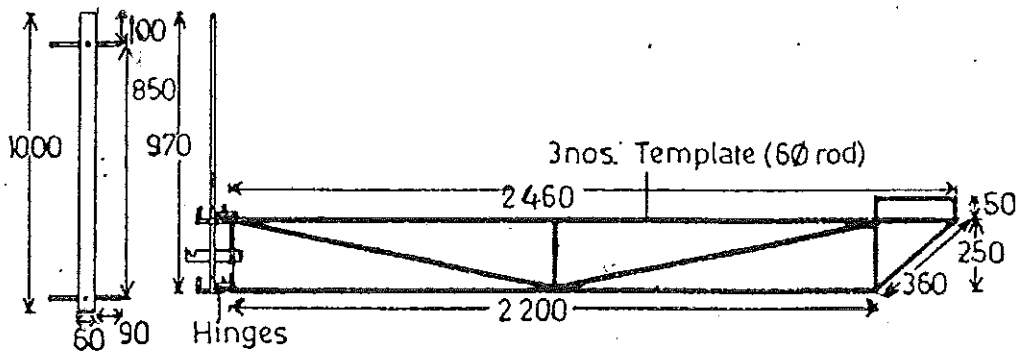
Steel Template and Gas Outlet for Extended Dome Plants
